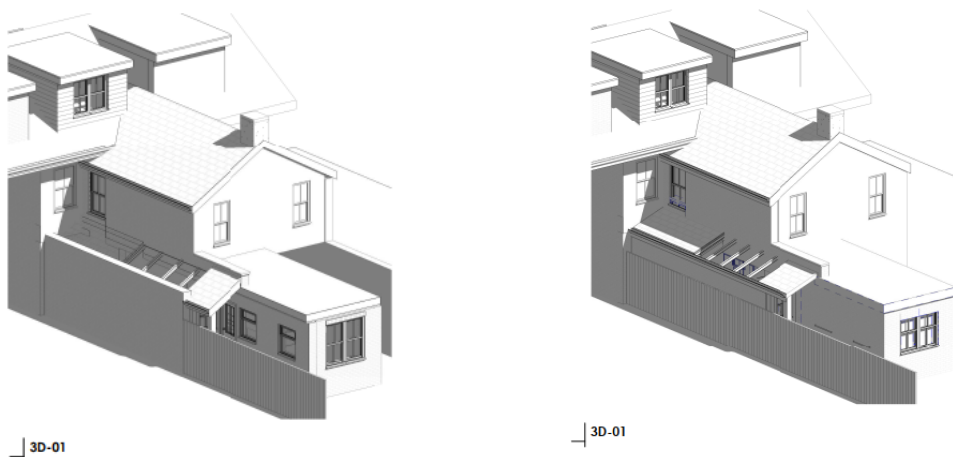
3D elevations provided by the applicant within this submission and 252221.
